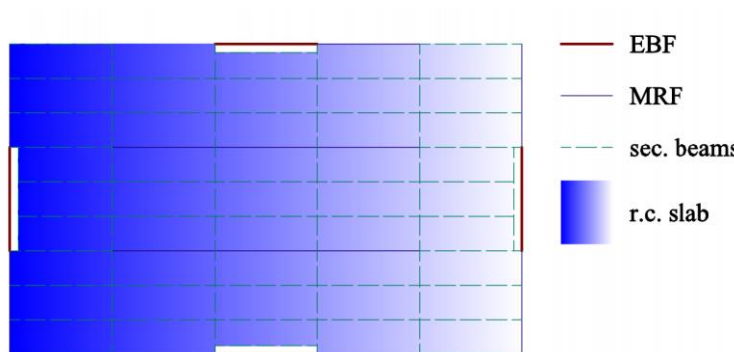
Arrangement of secondary beams to disconnect the RC slab from links
